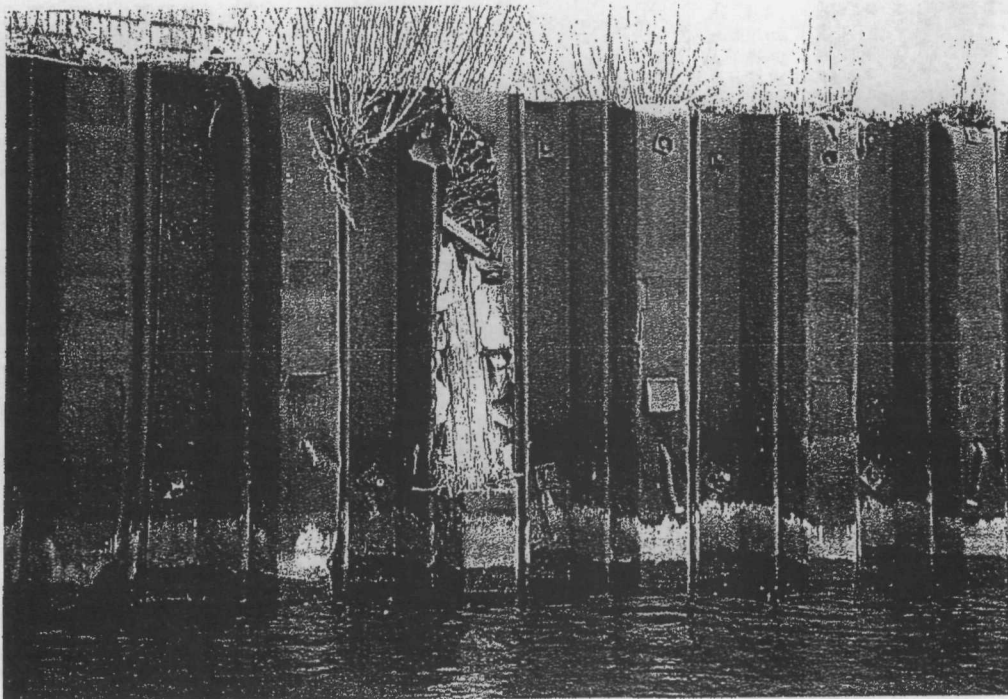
View of Typical Concrete Cap Condition along Waterline at Station 0+20, Looking North.
